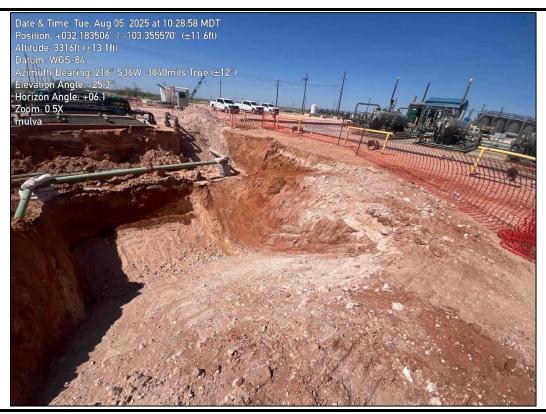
Southwest view of excavation extent. 8/5/2025
